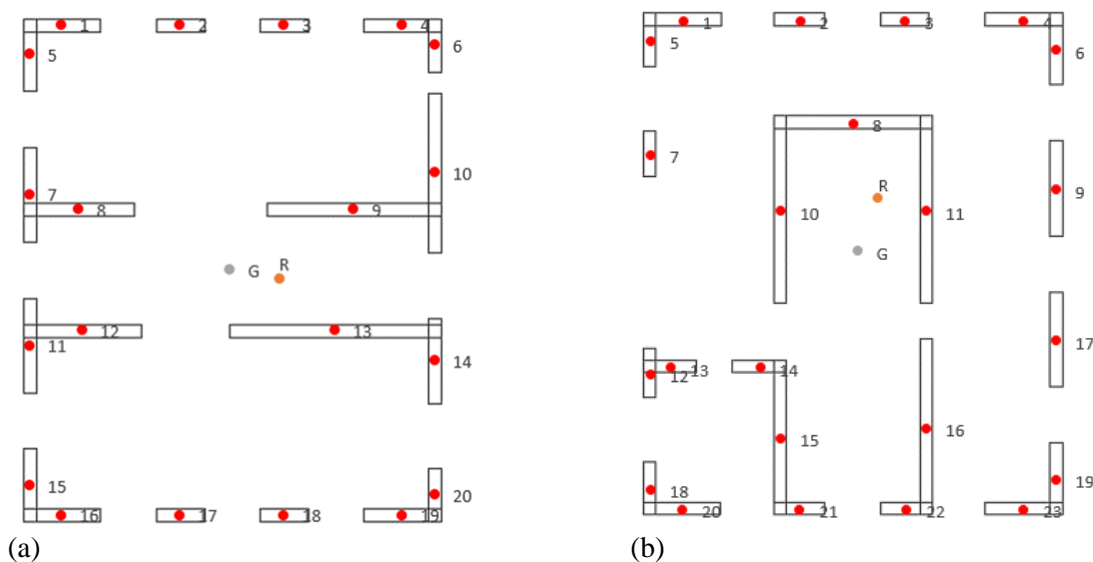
(a): left building, non verified walls: 1,2,3,4,16,17,18,19; (b): right building, non-verified walls: 6,7,9,12,15,17,19.
